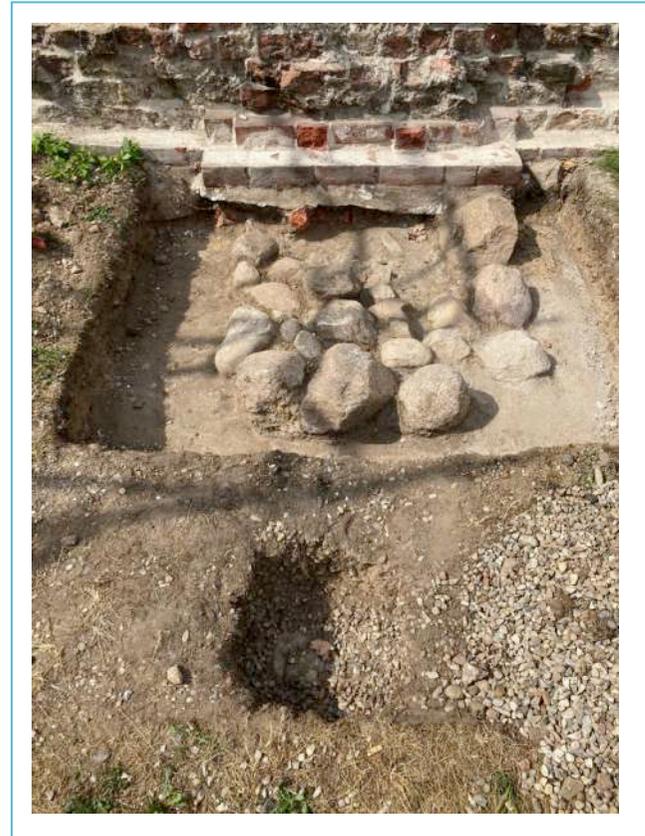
, Field stone foundation of Valdemar's Wall and position of the drainage in front of the wall, August 2020. © ALSH
